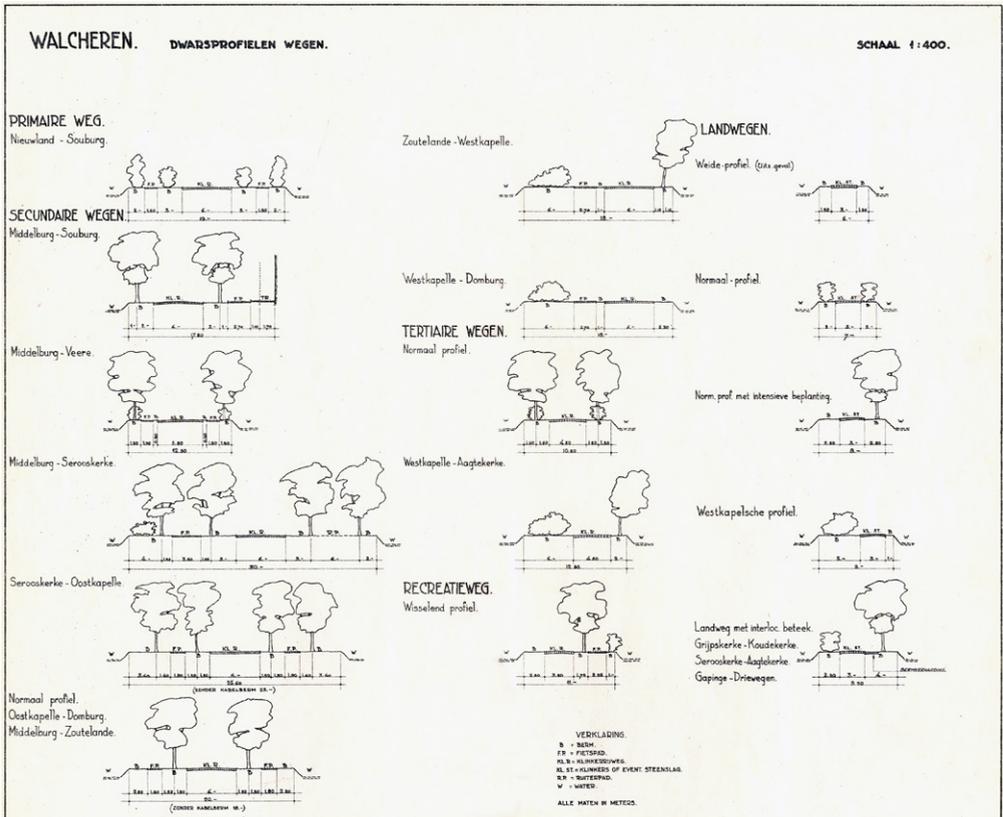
Sections of roadside planting (source: Van Bommel van Vloten, 1946)
